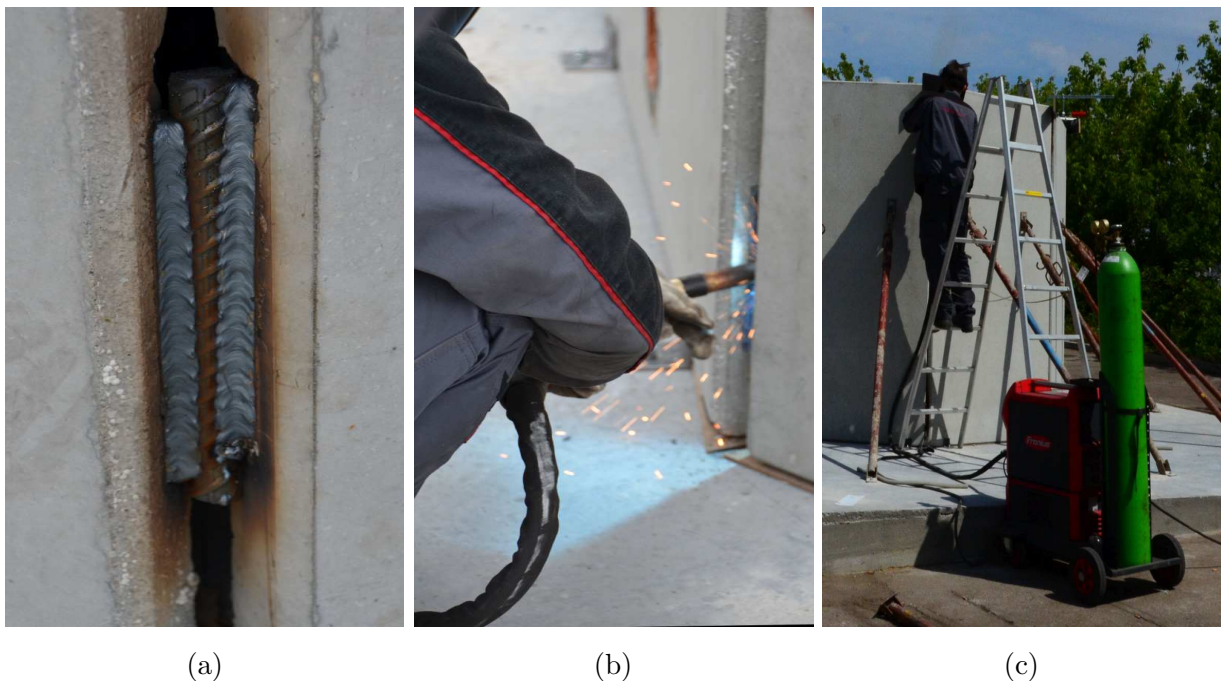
Structural connection of the elements; (a) reinforcement bar welded to the steel plate embedments of the outer shell; (b) bottom connection; and (c) top connection
